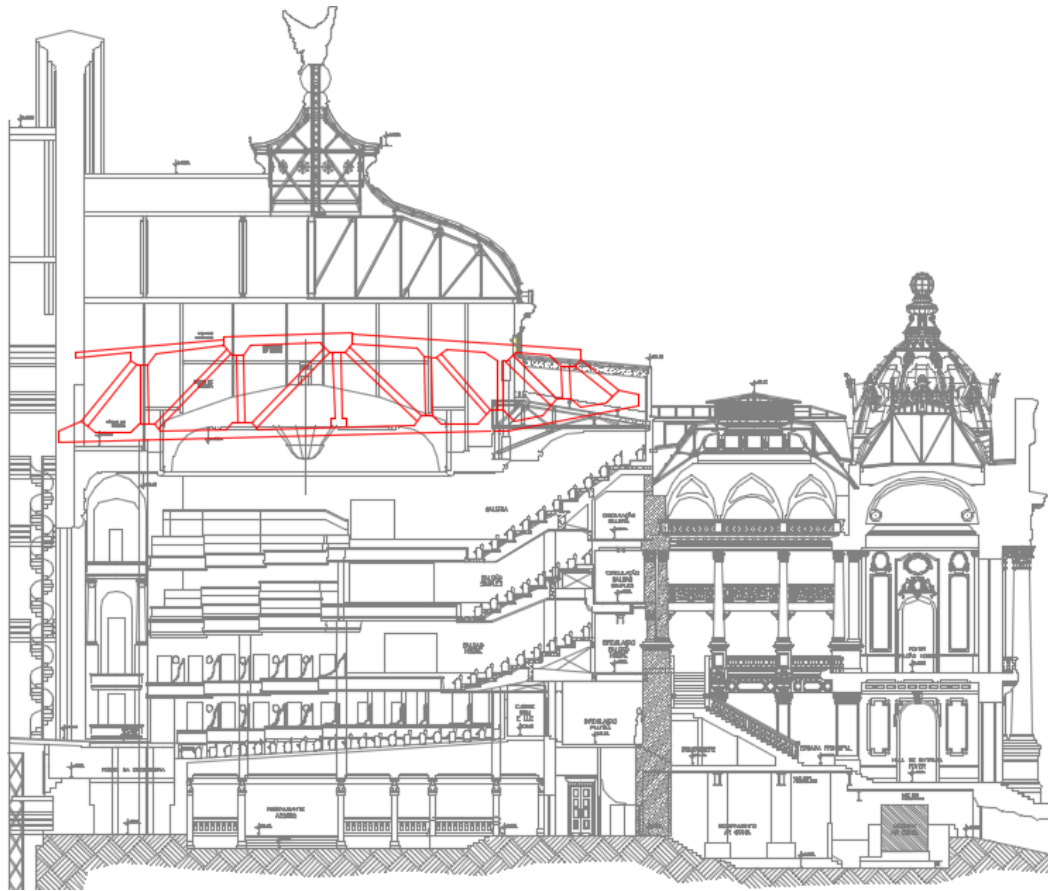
Concrete truss that replaced the cast iron piers (Cerne Engenharia e Projetos, 2006d)
